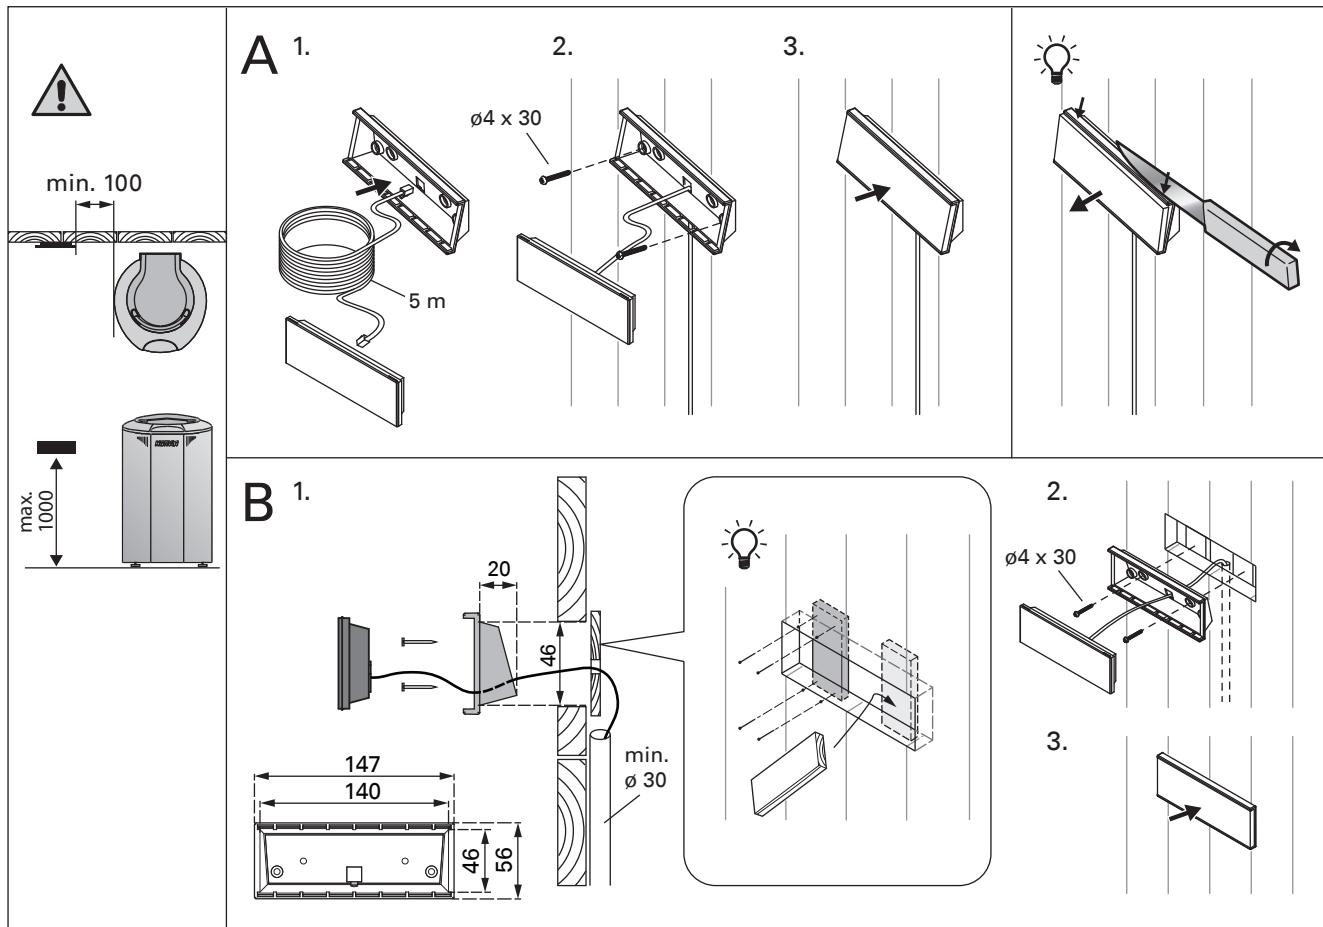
Installing the control panel (all dimensions in millimeters)
